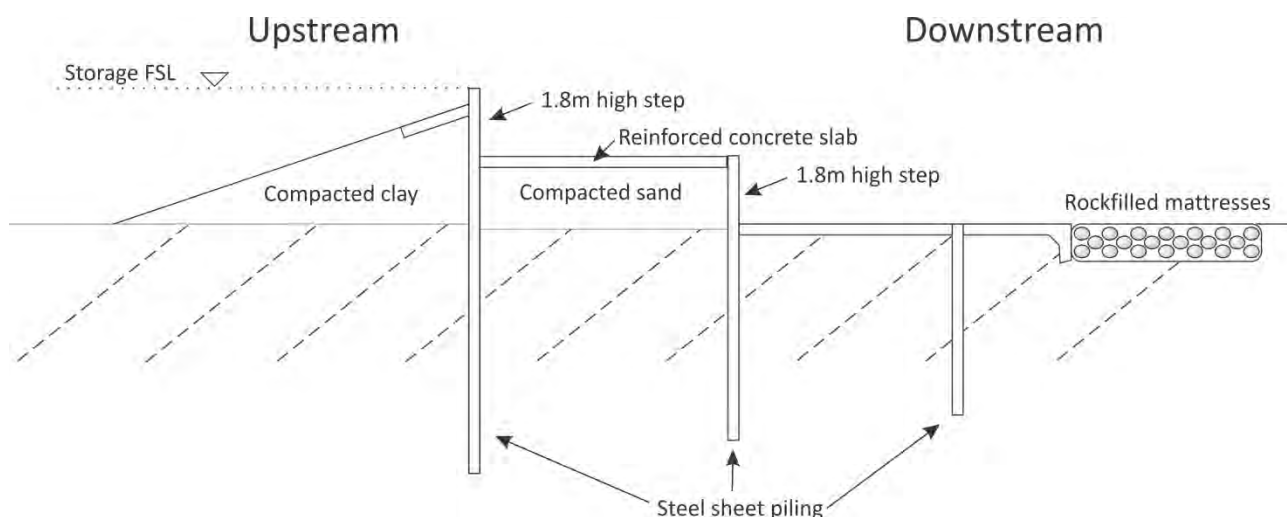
Schematic cross-section diagram of sheet piling weir
